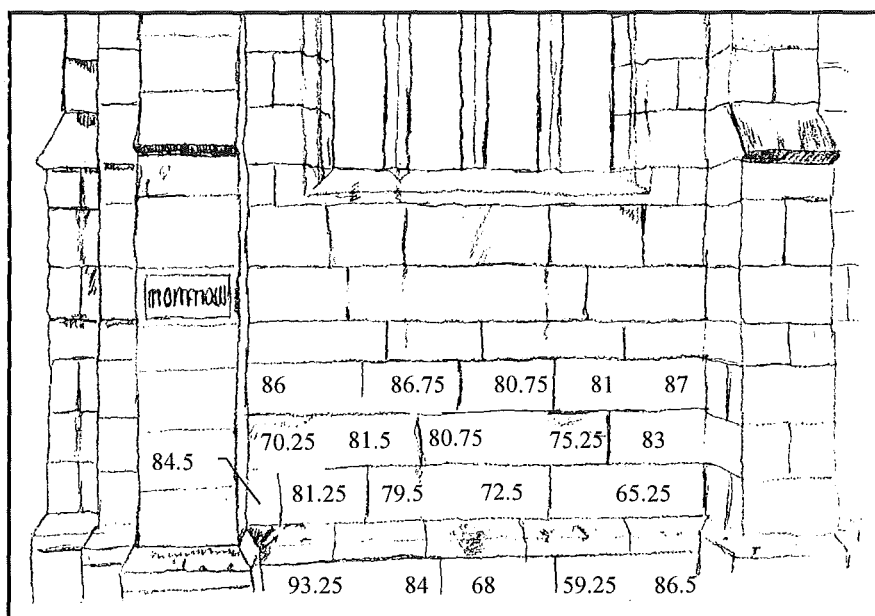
Sketch plan of Mary Tavy Vestry.
